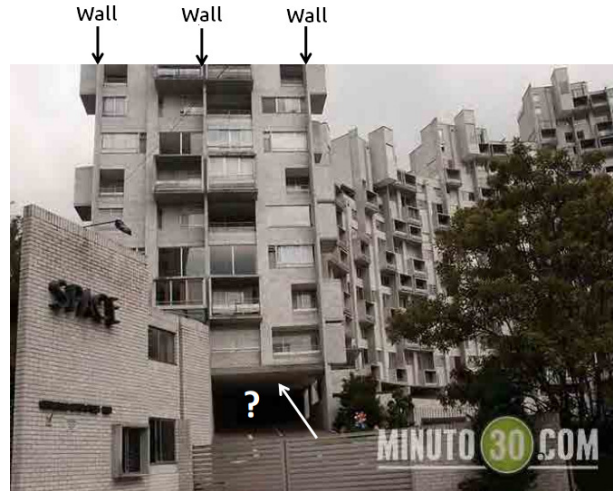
Lack of continuity in structural walls (Suárez, 2019).
